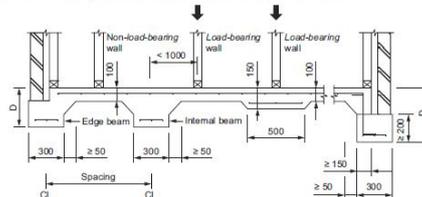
Footing slab and stiffened raft slab details for Class M sites
